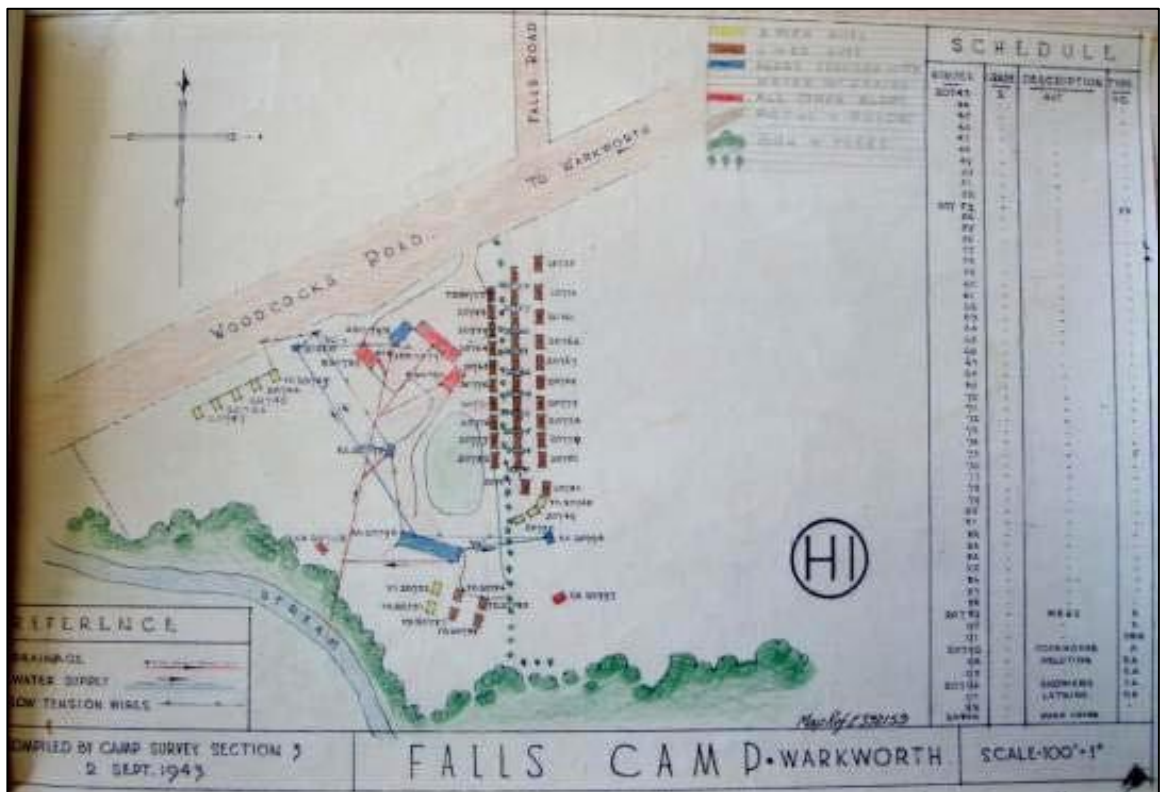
Plan detailing the layout of Falls Camp H1, situated along Woodcocks Road (source: Archives New Zealand, ACIO 8722 6/ 77/1).
